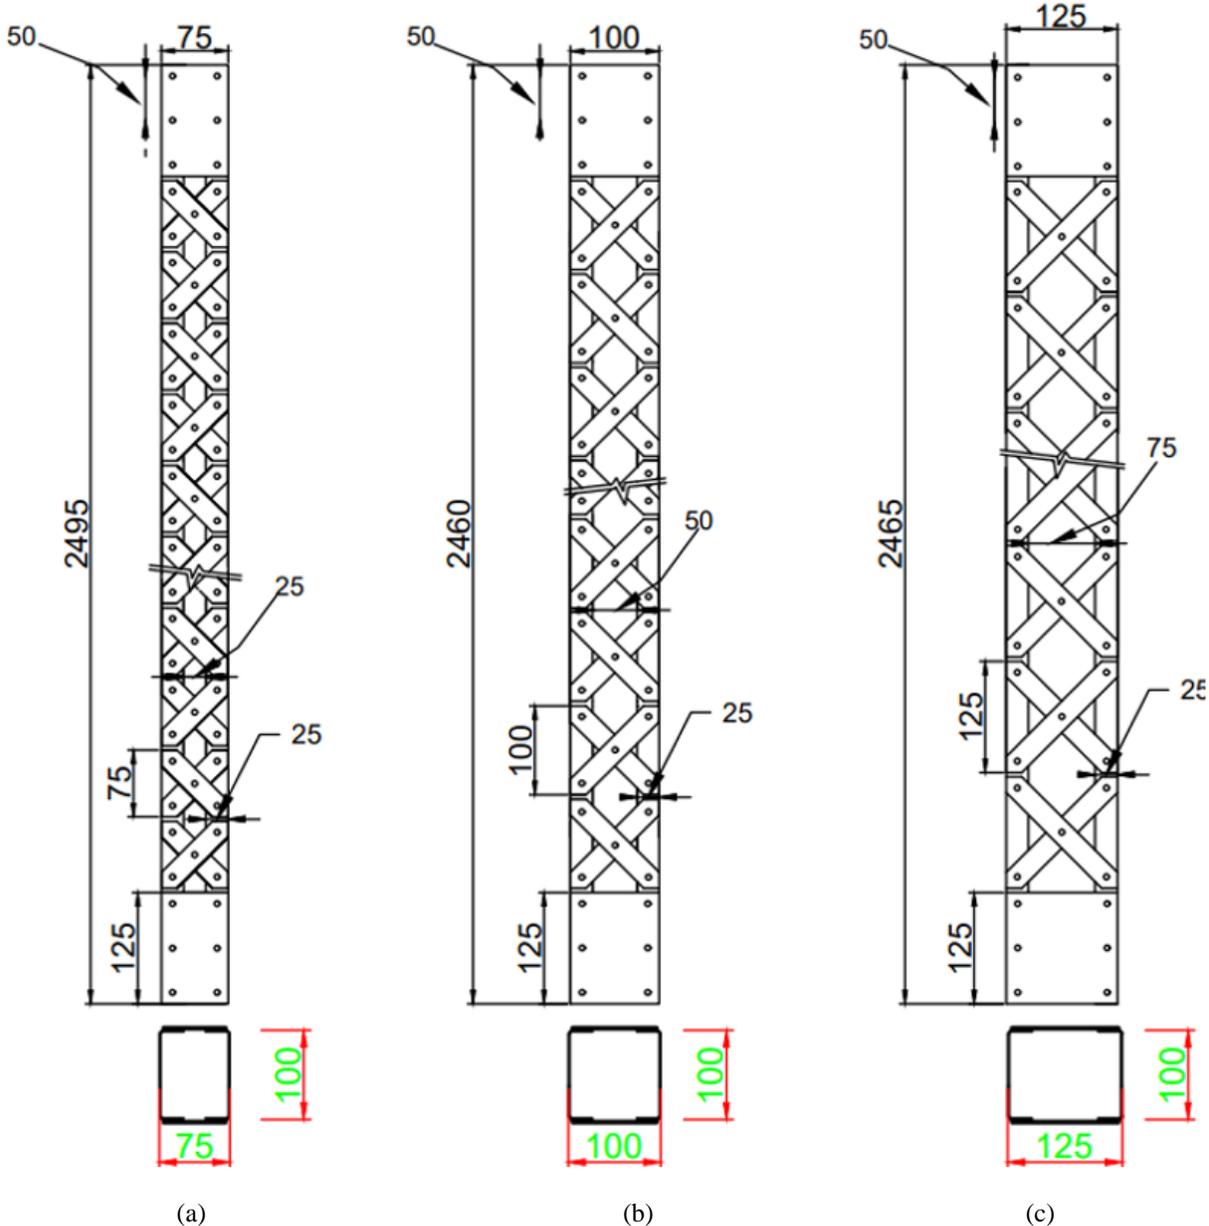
Longitudinal details of the test specimens, (a) DL-25-1.7 & DL-25-2.5; (b) DL-50-1.7 & DL-50-2.5; DL-75-1.7 & DL-75-2.5.
